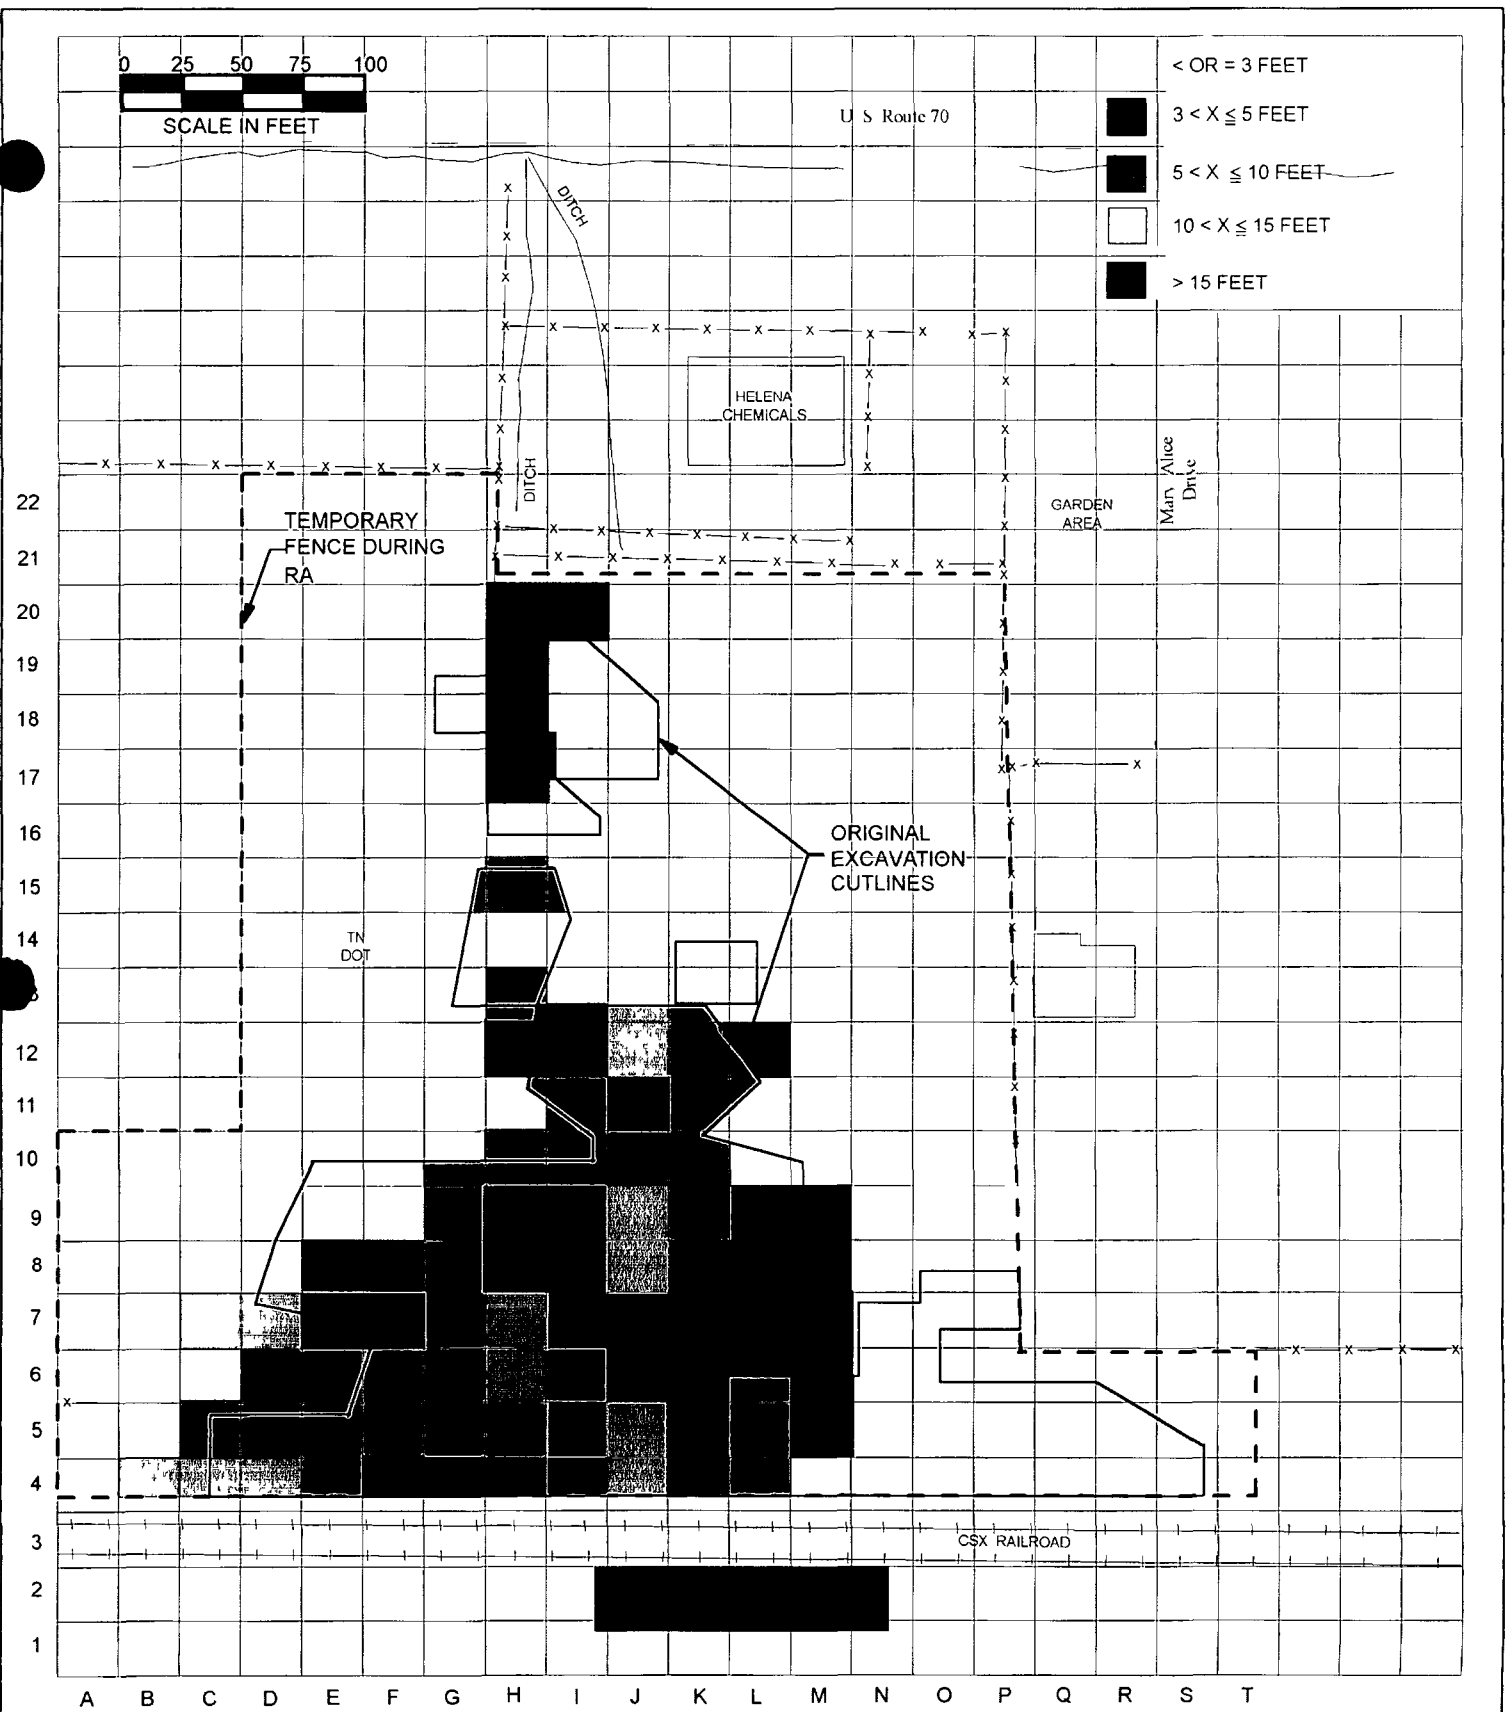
2 . Depth of Excavations, Arlington Blending Site
